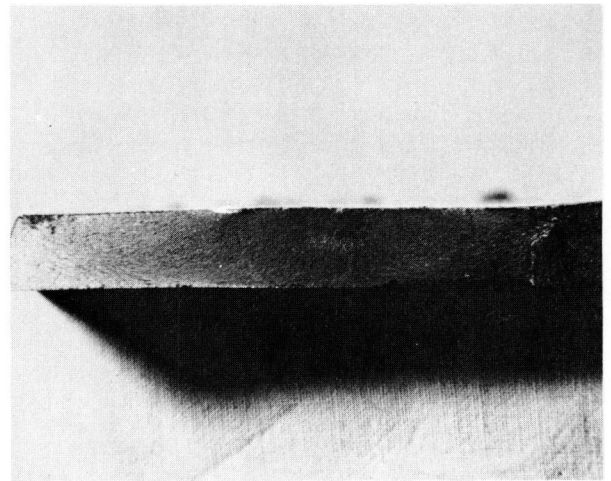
Typical failure cracks that initiated at the load points in the tension flange of rolled beams.
